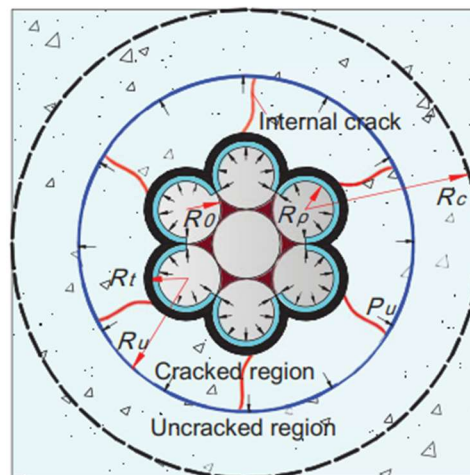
concrete cracking due to strand corrosion. (Wang et al. 2019)
